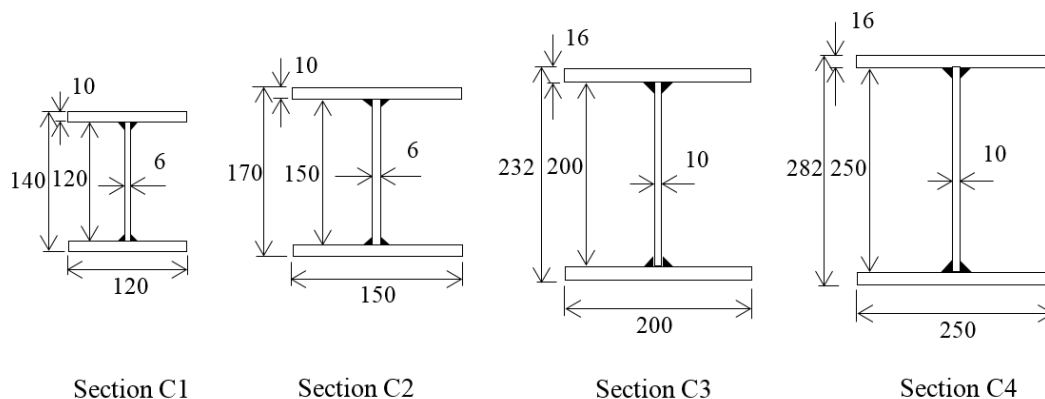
Nominal cross sectional dimensions of S690 welded H-sections
